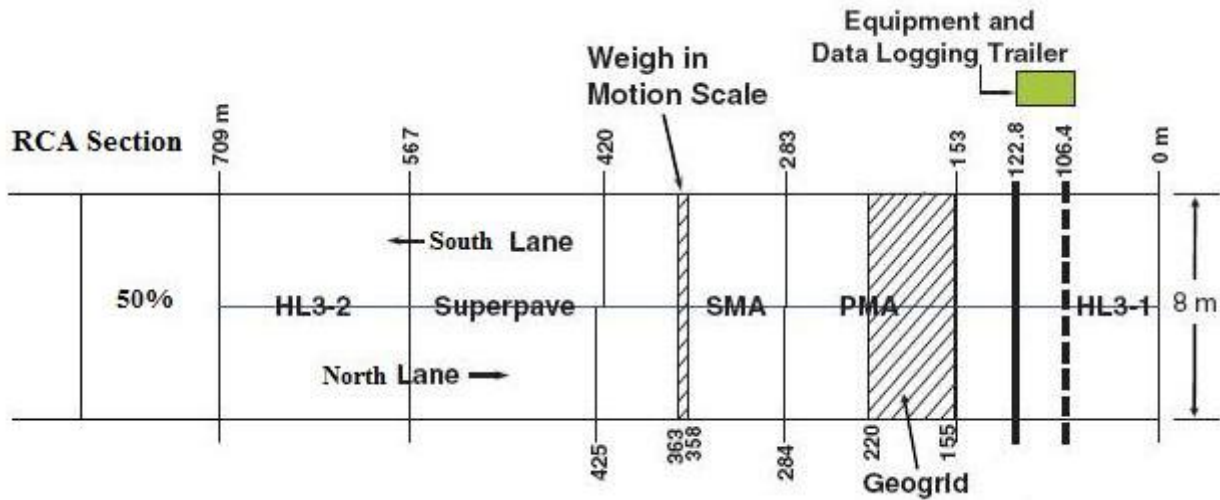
Flexible pavement portion of the CPATT Test Track after [Tighe 2007]
